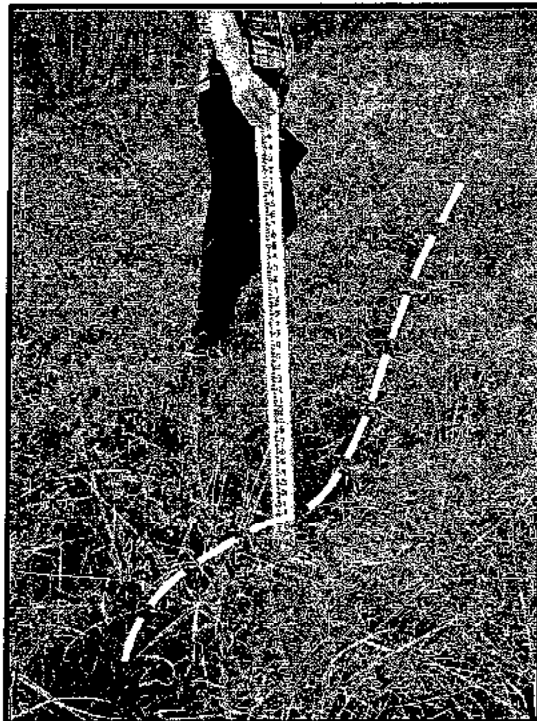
Erosion gully (\approx 1 foot deep) on downstream embankment
